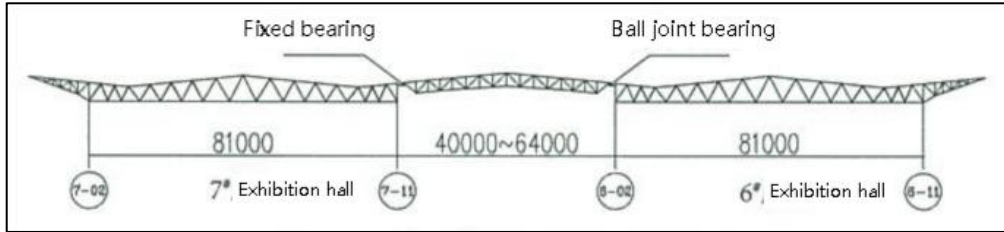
Roof Section Of Double-Layer Exhibition Hall
